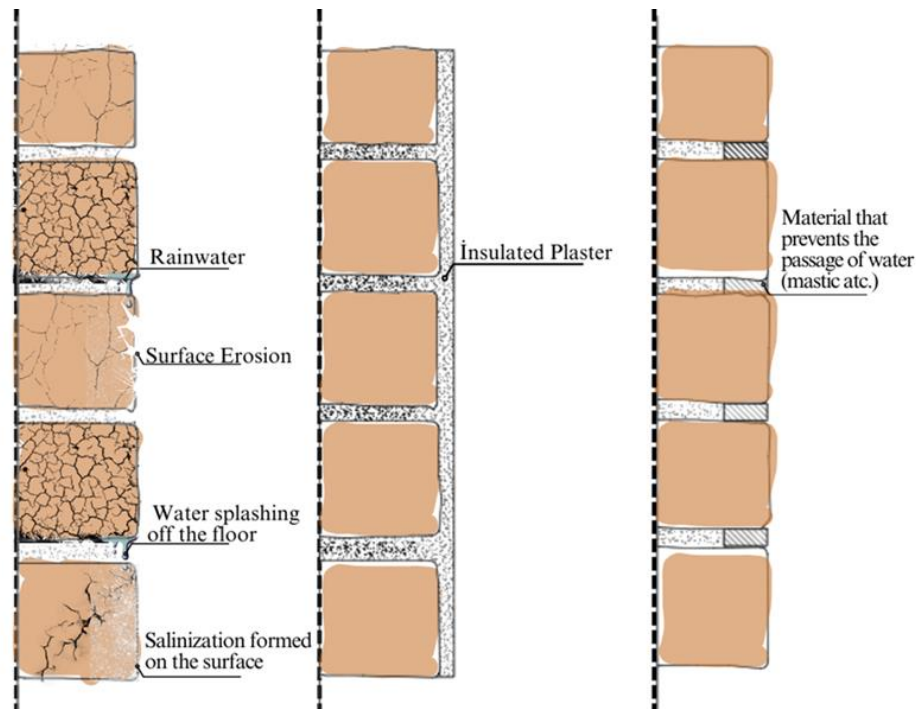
Precautions against water damage in a wall built with adobe blocks.
